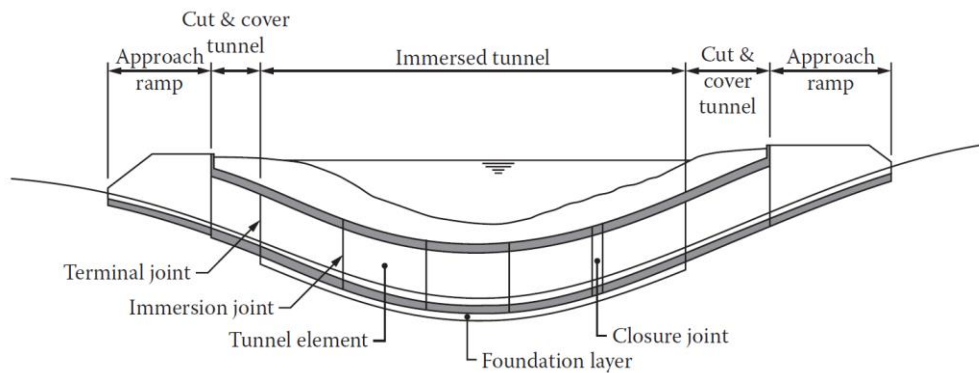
General layout of an immersed tunnel (Lunniss & Baber, 2013)
